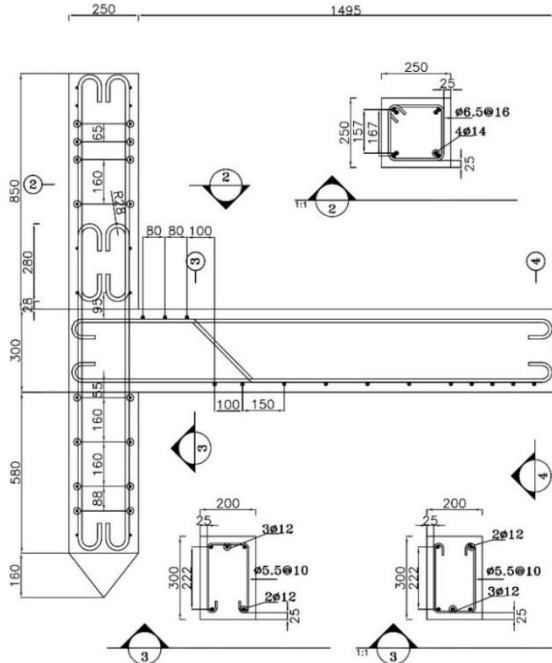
Dimensions and reinforcement details of exterior beam-column joint of Specimen SC1
